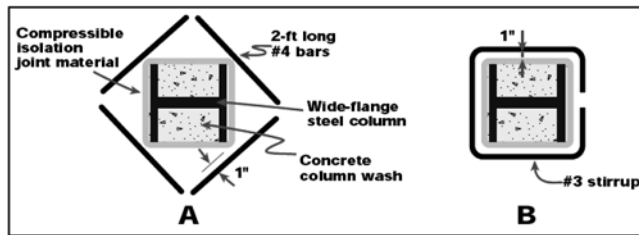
Eliminate the normal isolation-joint boxouts at wide-flange steel columns by wrapping the column with compressible materials and using 2 ft (0.6 m) lengths of No. 4 bars (A) to control cracking at the re-entrant corners. To speed up steel placement at the columns, have the reinforcing bar supplier fabricate continuous No. 3 stirrups that workers can easily bend open to fit around the column (B). In either case, the steel should be positioned with a top-and-side clear cover of 1 in. (25 mm) (Holland and Walker 1998).
